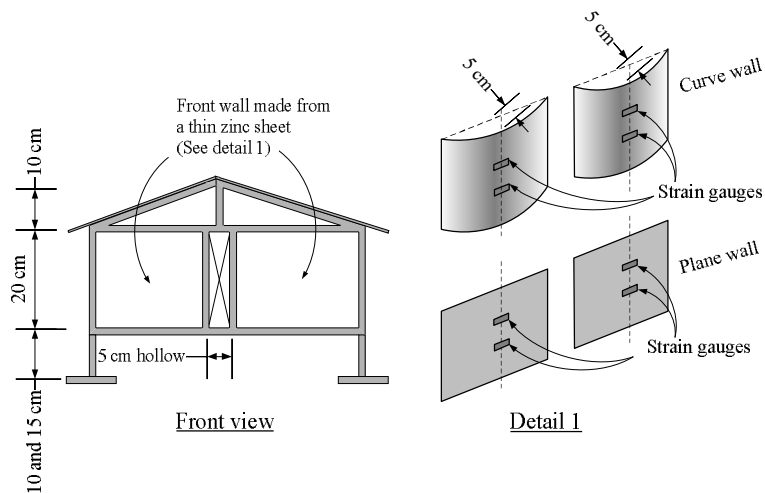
One-storey house with hollow walls: plane and curve walls (see Detail 1)
